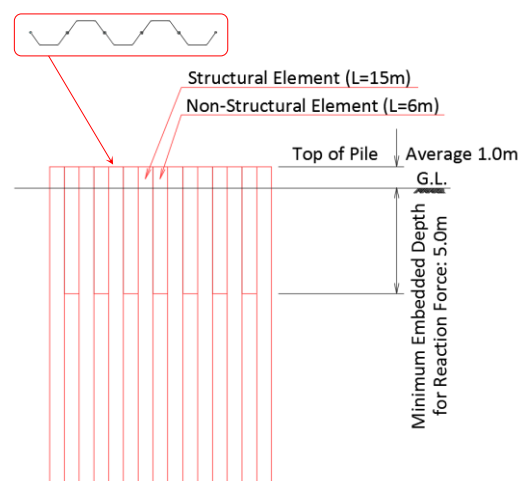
Drawing of U steel sheet pile wall (SP-III A)
